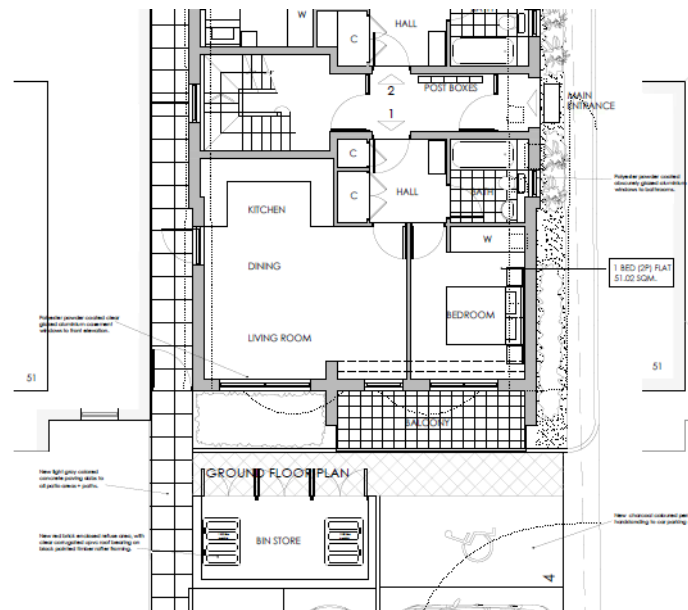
Previous planning application (20/01556/FUL) ground floor layout
